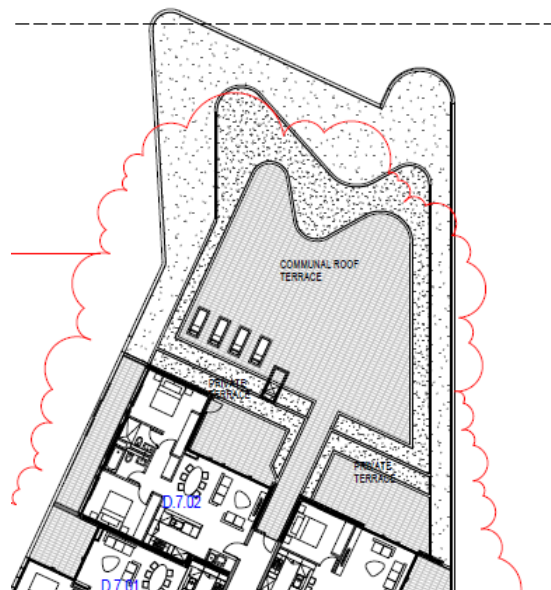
above illustrates the proposed changes to the roof top common open space. The generous approved private open space terraces for Units 2 and 3 at level 7 are proposed to be reduced in area to enhance the communal area. The landscape design of the space is also proposed to be altered to reflect the proposed curvilinear architectural expression that is introduced in this modification application.
